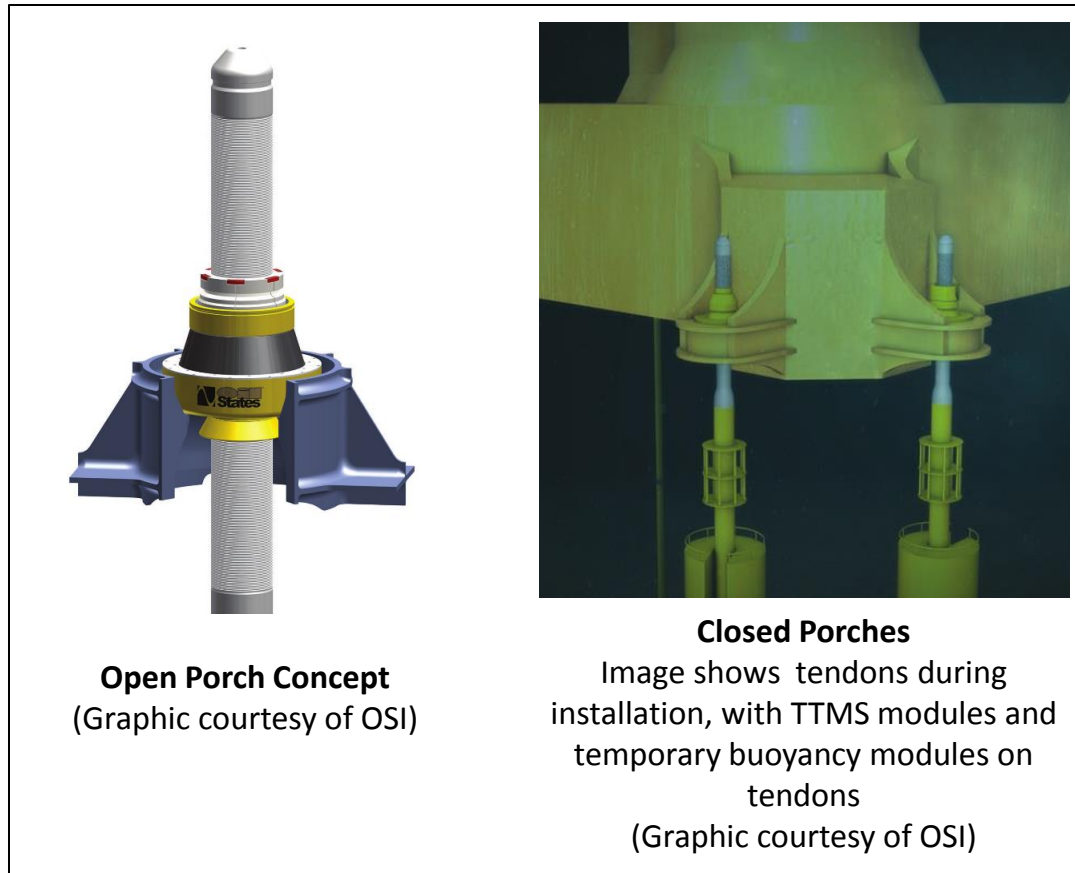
Open & Closed Porch Designs (© Oil States Industries, Inc.)
